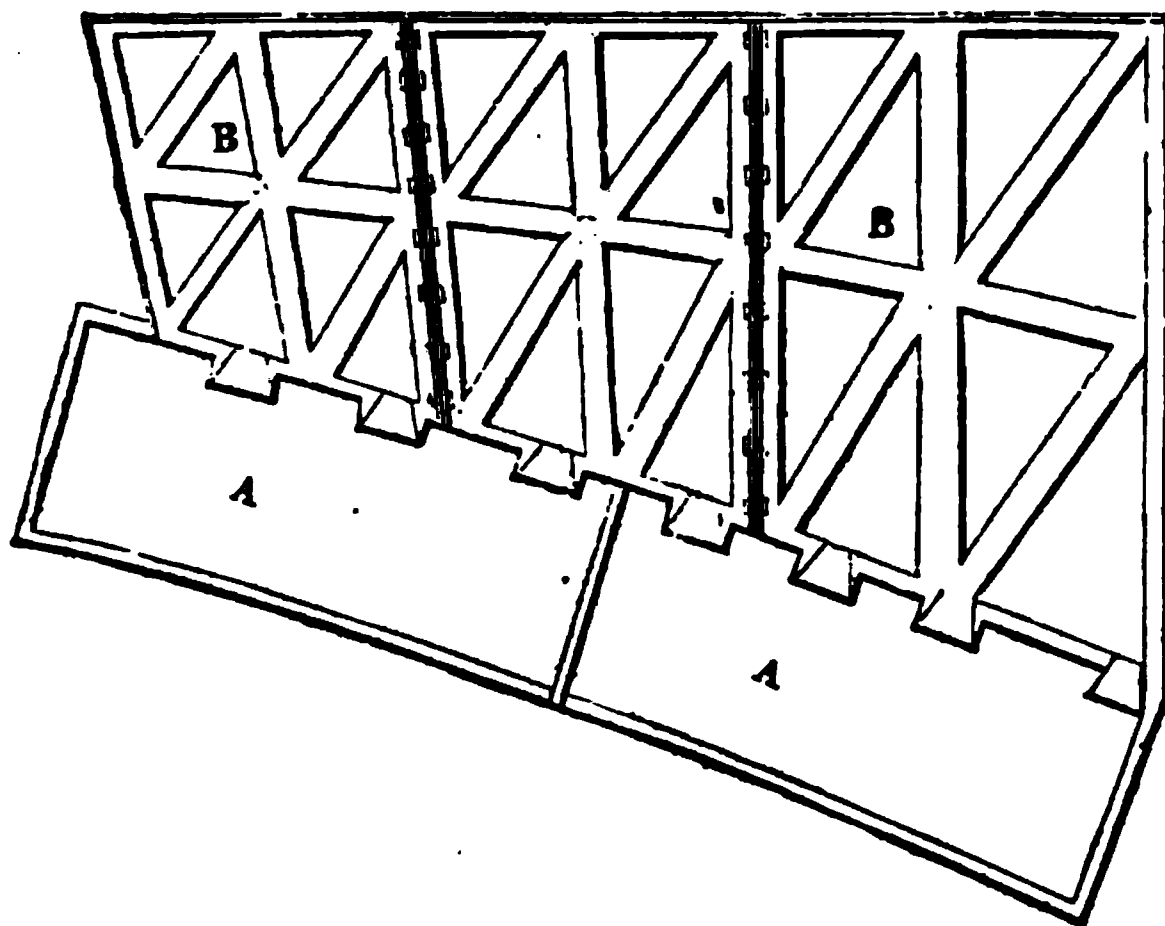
Represents a portion of a cast-iron plate arch with an open cast-iron beam.
